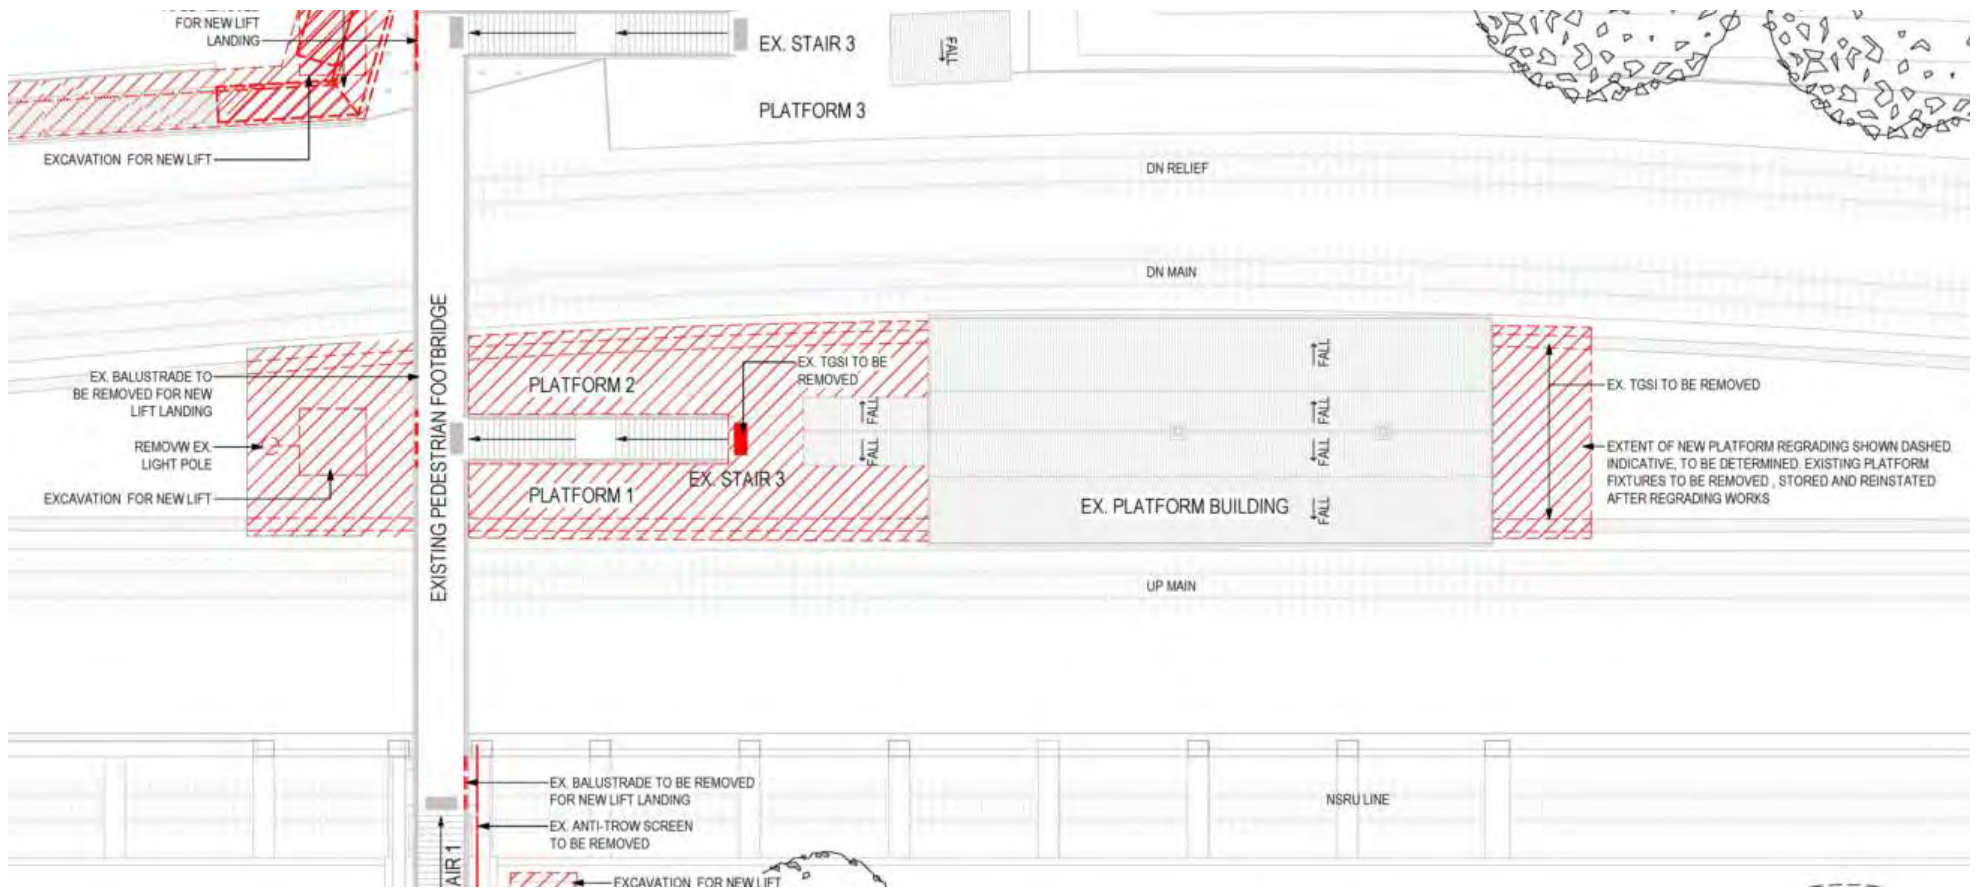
Plan indicating scope of demolition and excavation works (red shading) on the island platform of the Station – Works here relate to platform grades and TGS1 removals. (Source: Transport for NSW)
